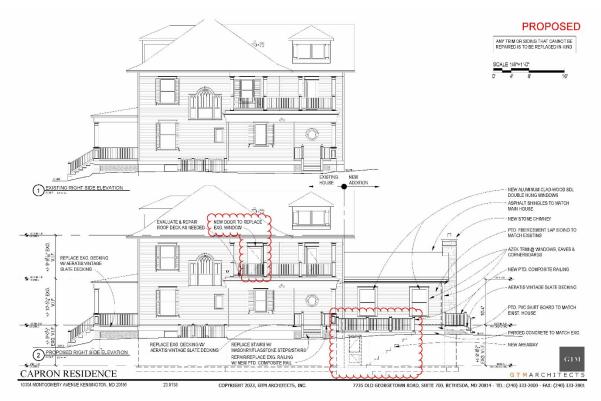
The revised right-side elevation shows the existing, top, and proposed areaway and window converted into a door on the second floor clouded in red.
